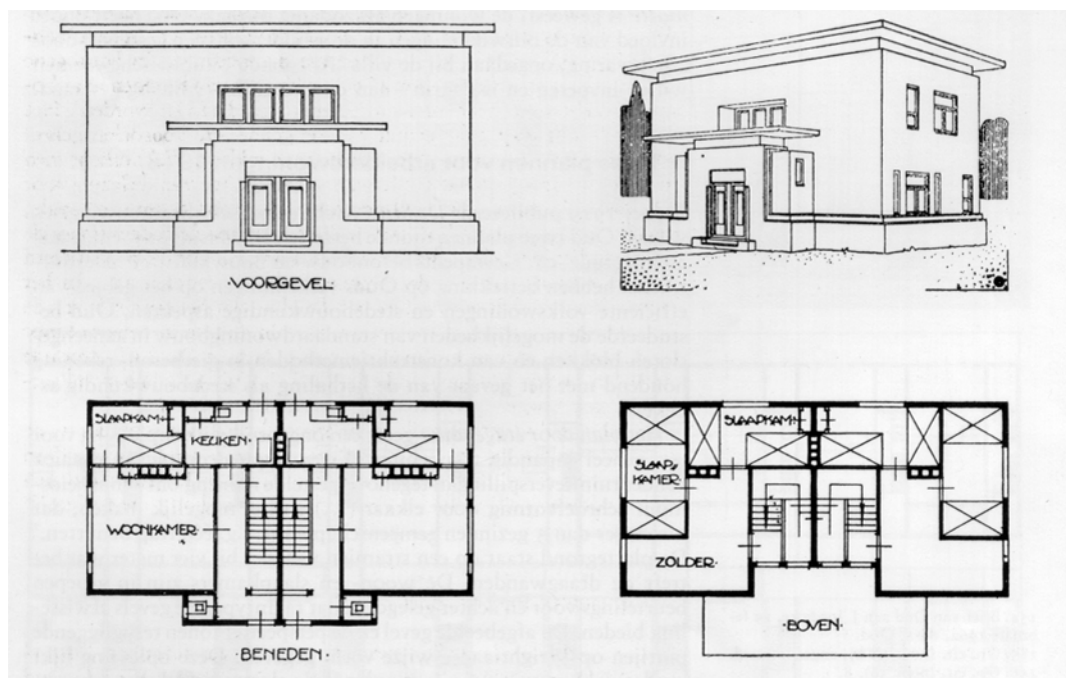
Double Workers' Housing in Reinforced Concrete, 1918, façade, persp. & plan layout
